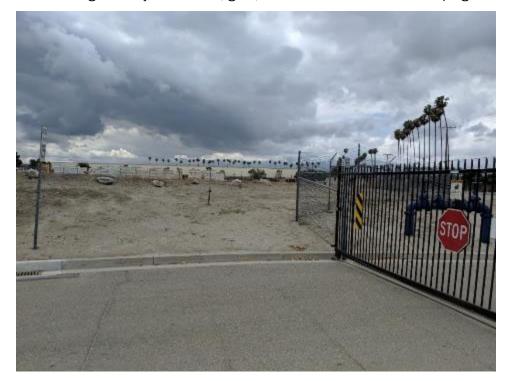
Area adjacent to front gate entrance where landscaping improvements are planned, looking south.
